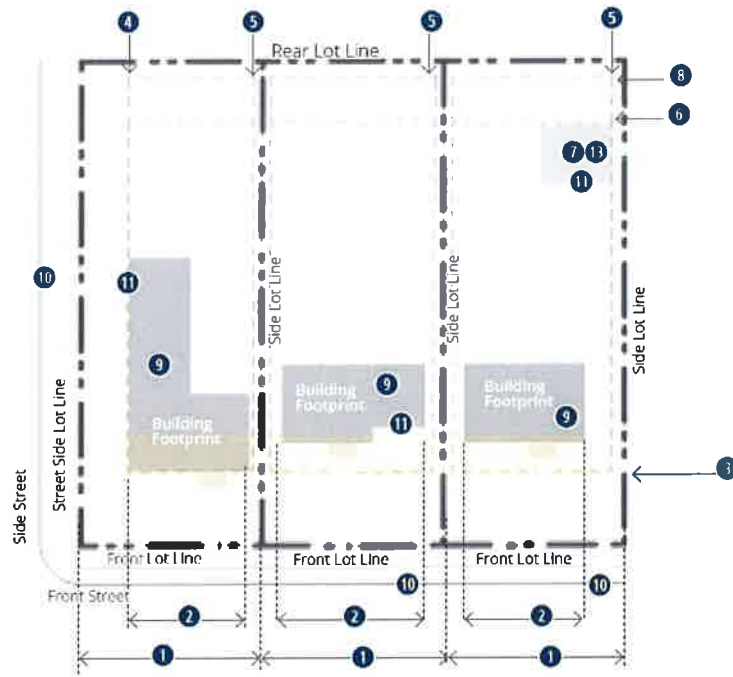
(2). N2 district diagrammatic plans and elevations.
